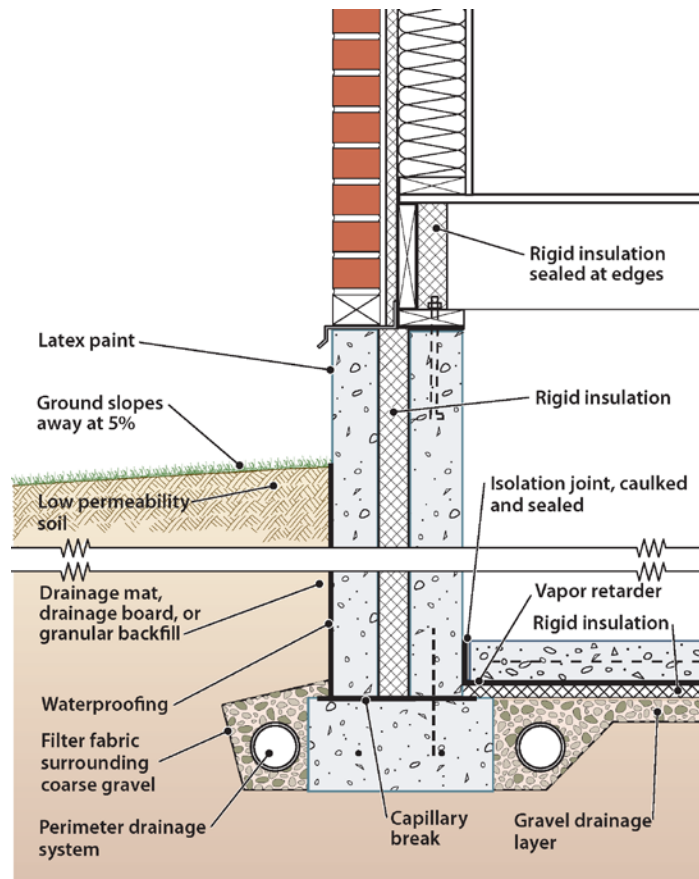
Cast-in-place concrete foundation wall with integral rigid insulation
